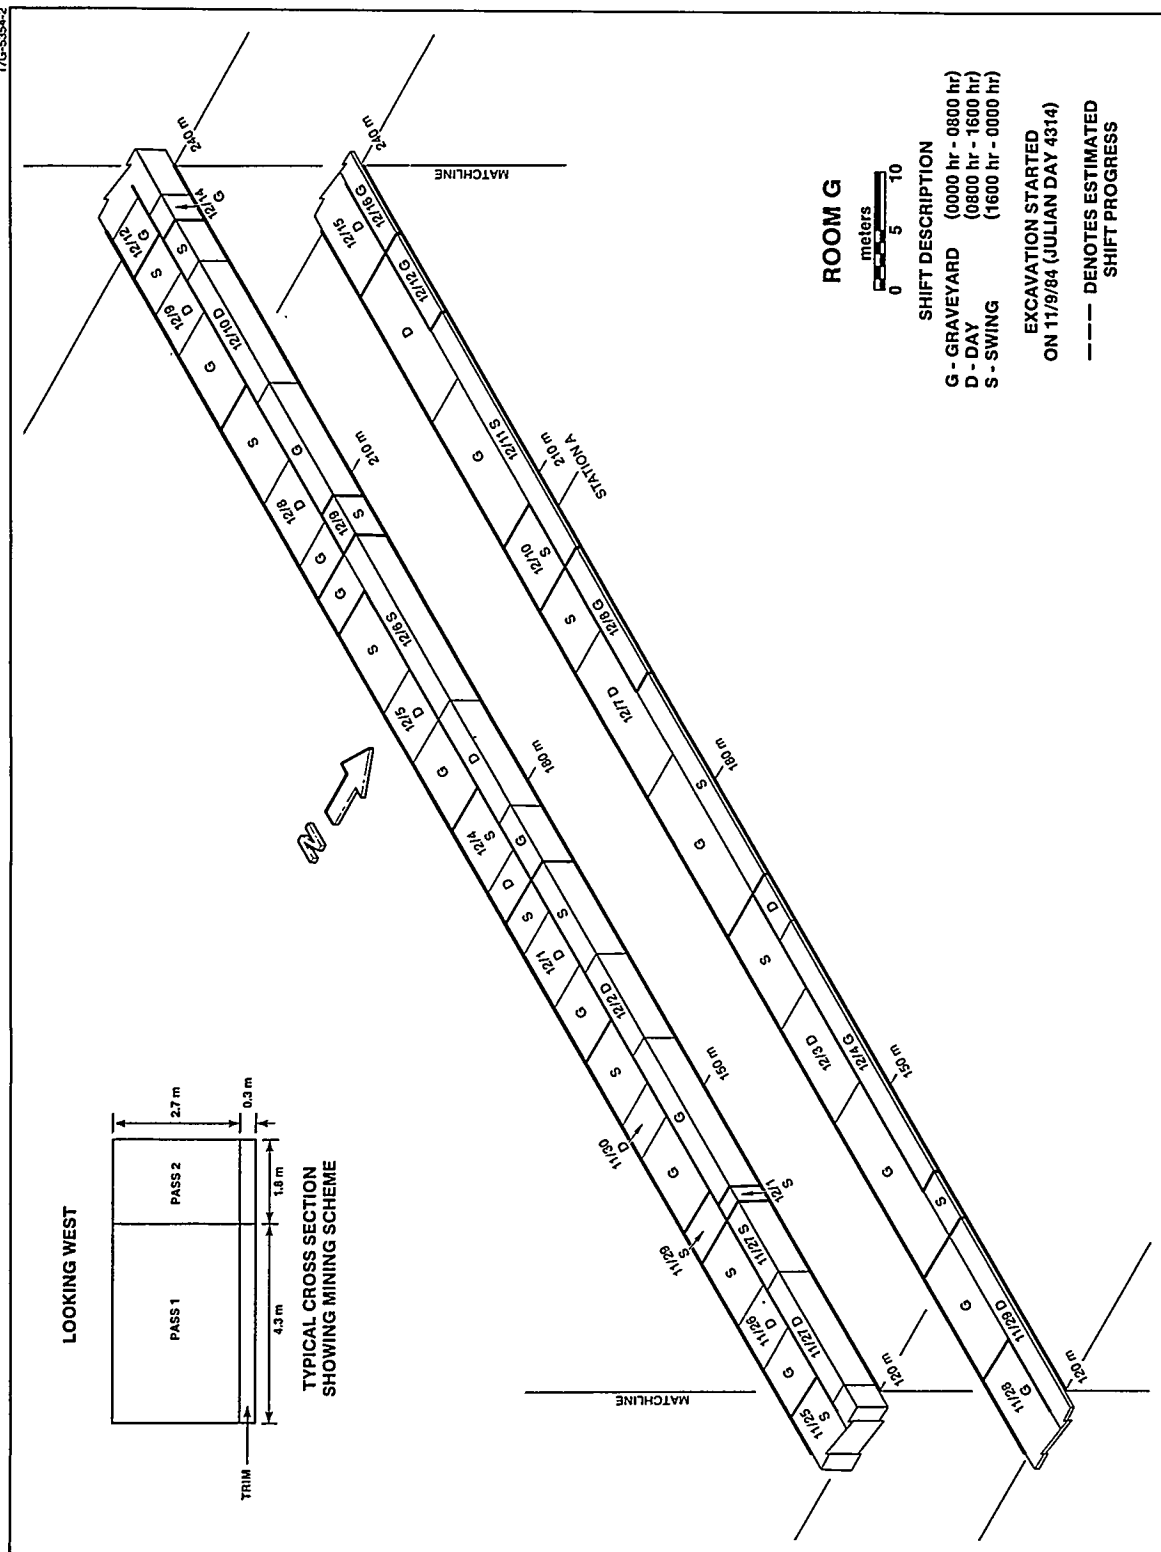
Isometric View of Excavation Progress, Room G, 2 of 3
